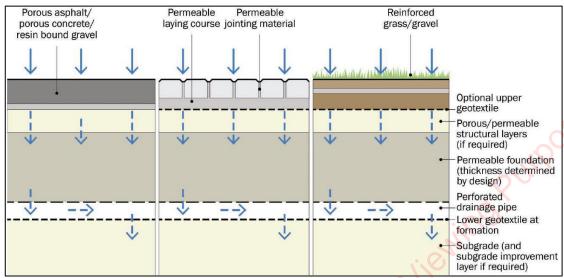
Detail of Type B Pervious Paving (CIRIA C753)
